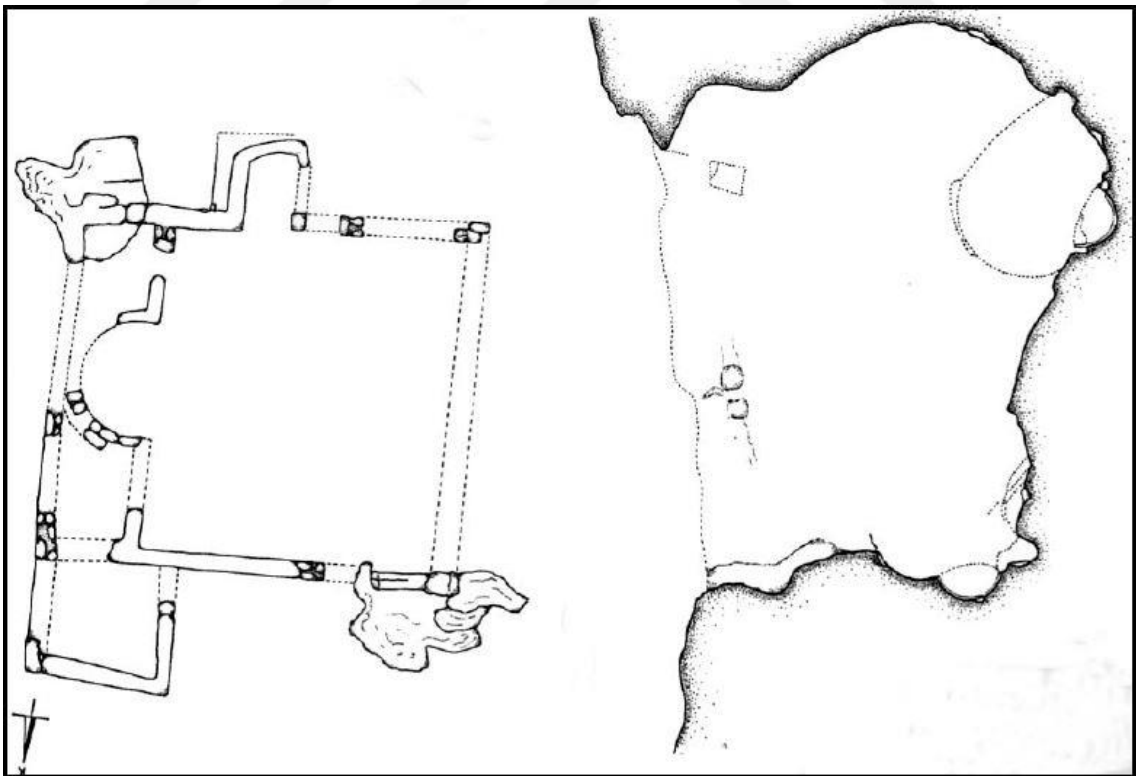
Plans of the cave and the church at 'Unnamed Site' O (Erten and Özyıldırım 2007, fig. 1).
